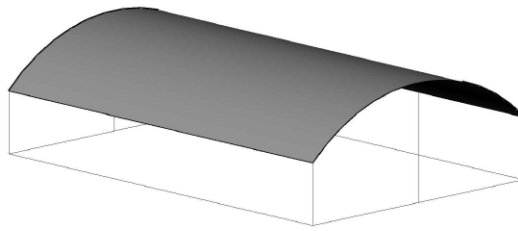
Structure with cylindrical roof shape used in the wind action calculations
